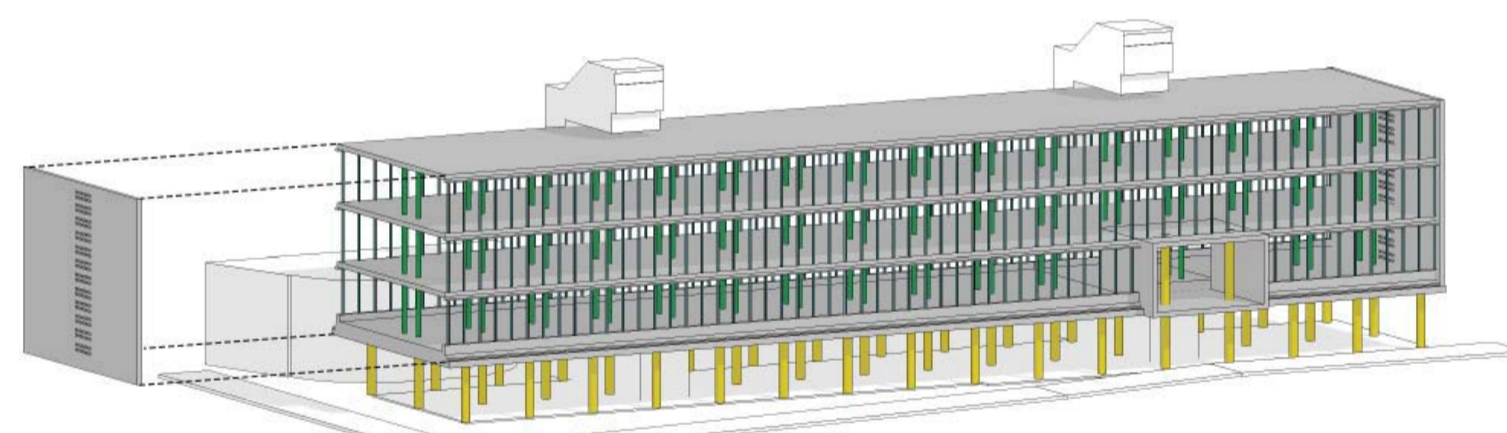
Three dimensional structural diagram of the Meat Board building.
